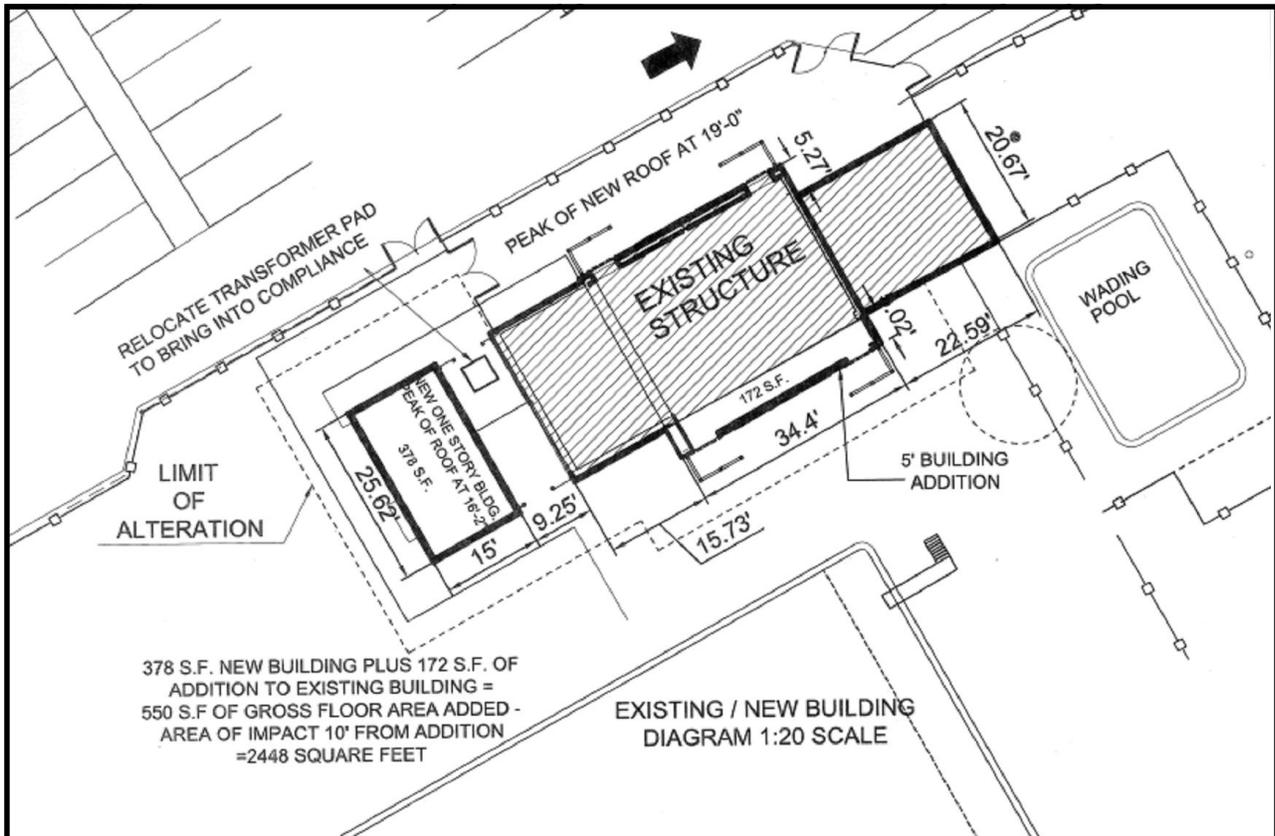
Inset of the proposed new structural additions. Note the new structure, the addition to the 1966 pool house, and the new roof for the existing structure.
